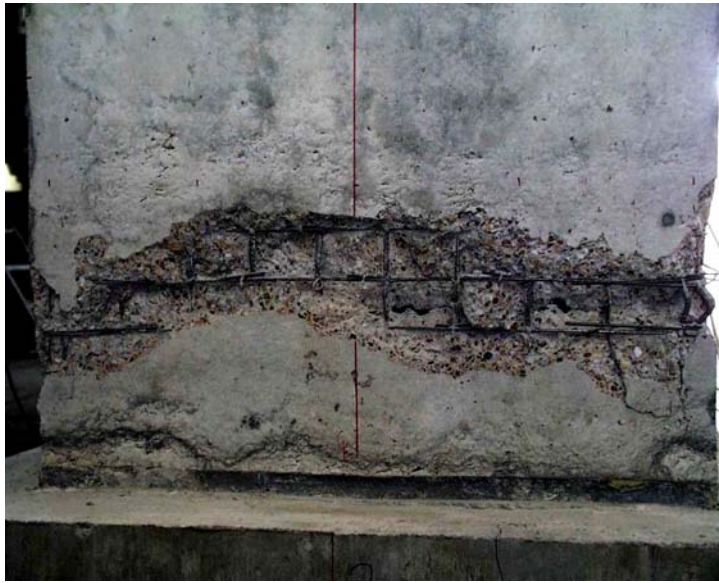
Specimen P12: Photo of East Wall at End of Test
